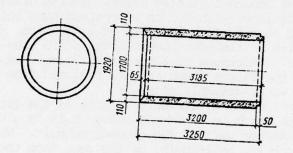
Reinforced concrete conduit with a juncture in a "quarter"
